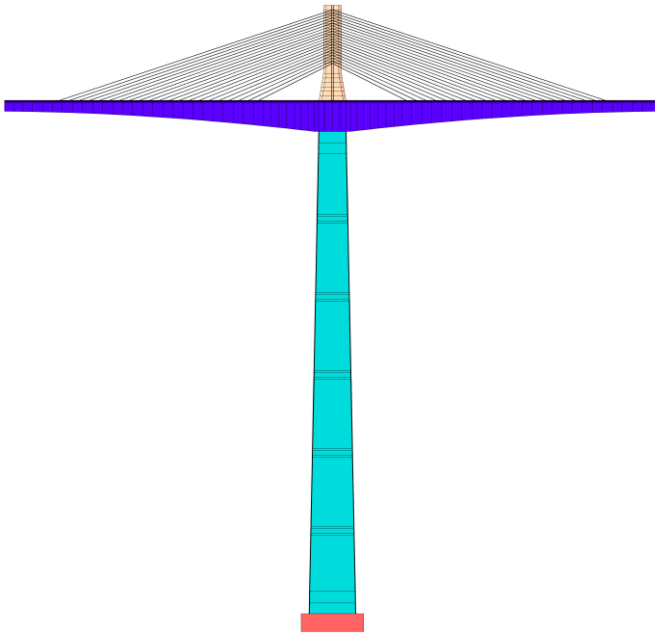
Structural drawing of pier section of Mozhai Wujiang super large bridge
